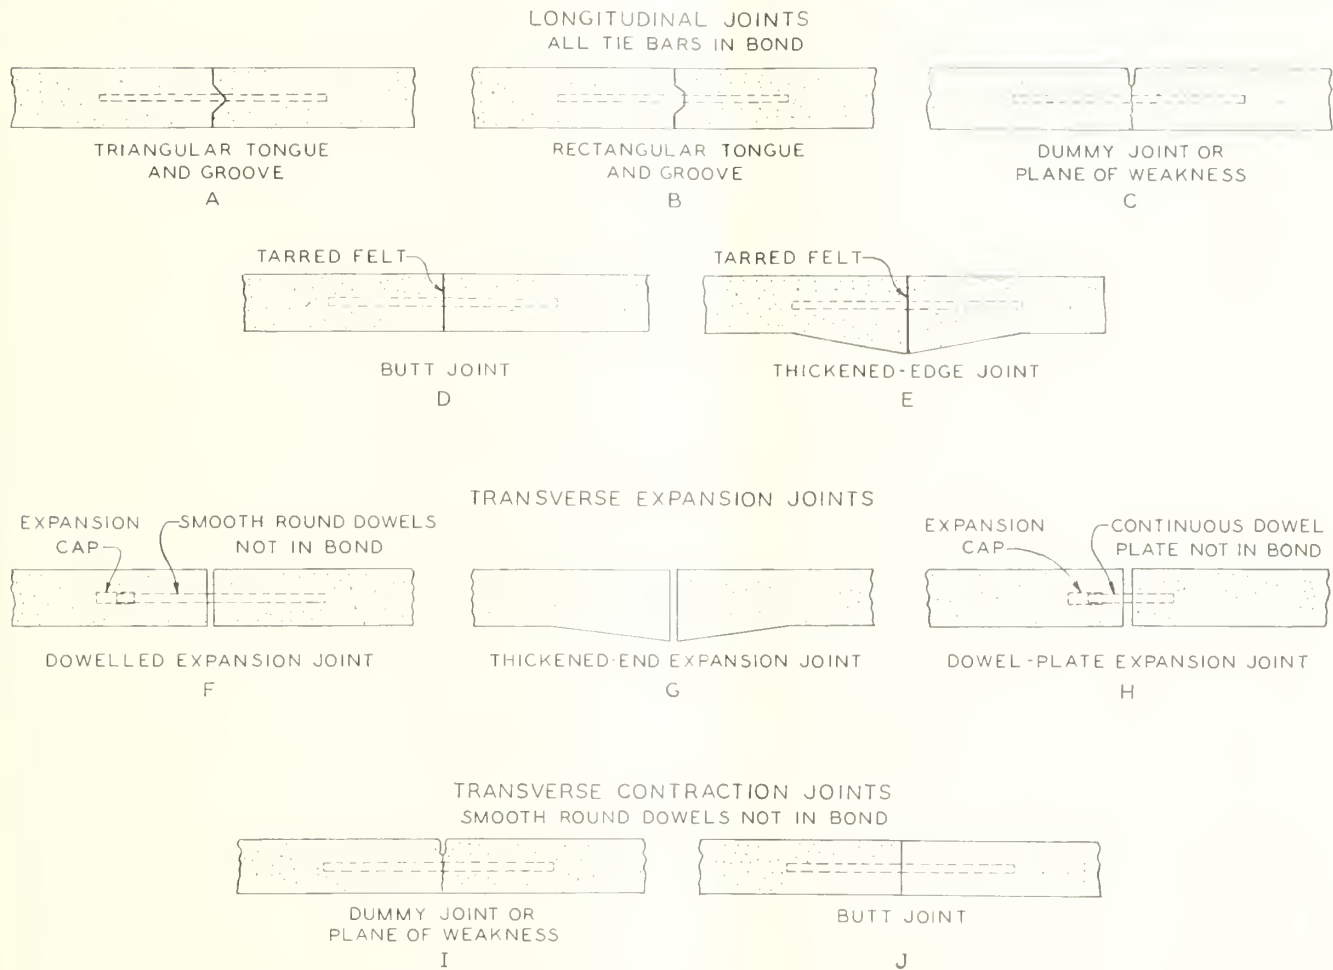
TYPES OF JOINTS FOR CONCRETE PAVEMENTS.
